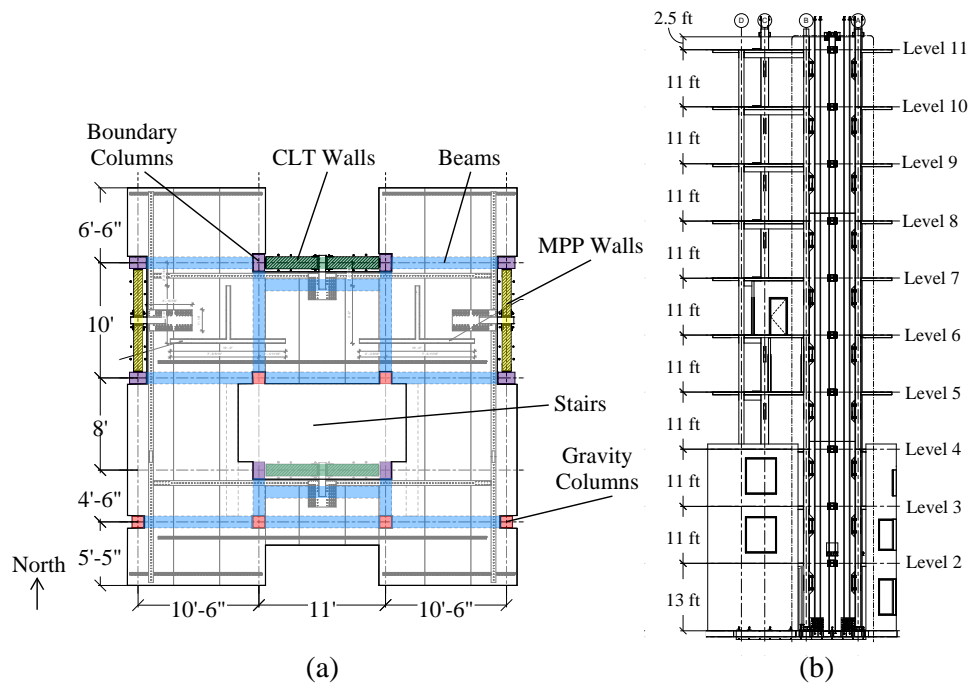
10-Story test specimen (a) typical floor plan showing beam, column, and wall layout (b) elevation view
